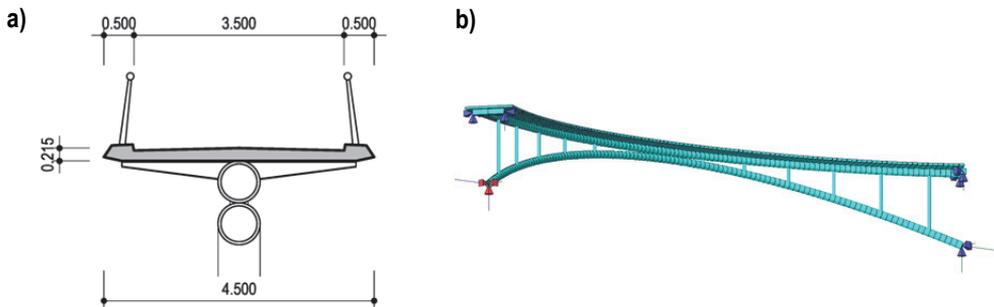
Bridge supported by the curved arch – a) cross section, b) calculation model
